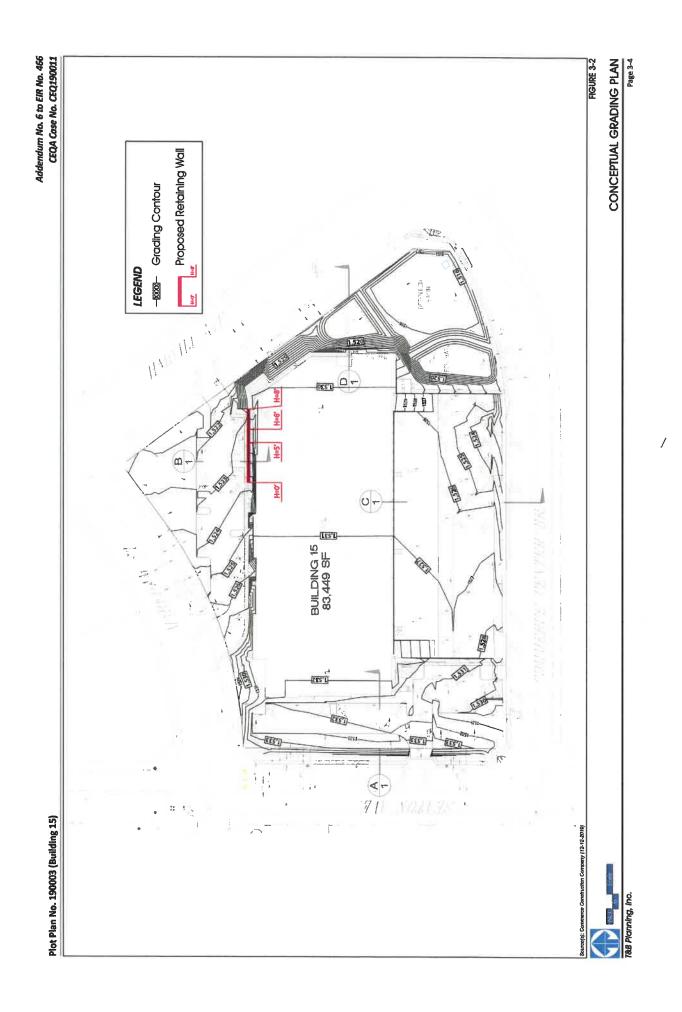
, Conceptual Grading Plan, depicts the Project's proposed grading plan. As shown, the site would be graded in a manner that largely approximates the site's existing topographic conditions. The Project would require a total of 15,434 cubic yards (cy) of cut and 46,782 cy of fill, requiring an import of 31,347 of fill material. It is expected that earthwork material imported to the site would be sourced from other building sites within the MFBCSP, or a distance of up to 1.0 mile from the Project site. No blasting is required for the Project.
